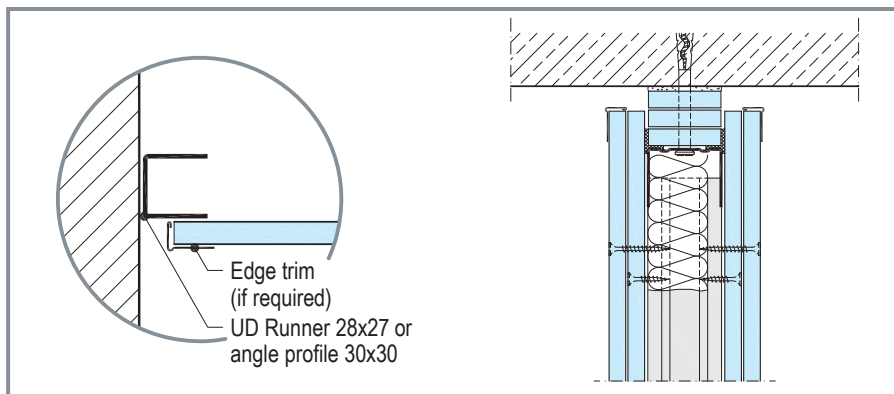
Connection design sliding, as shadow joint (ceiling and partition)
